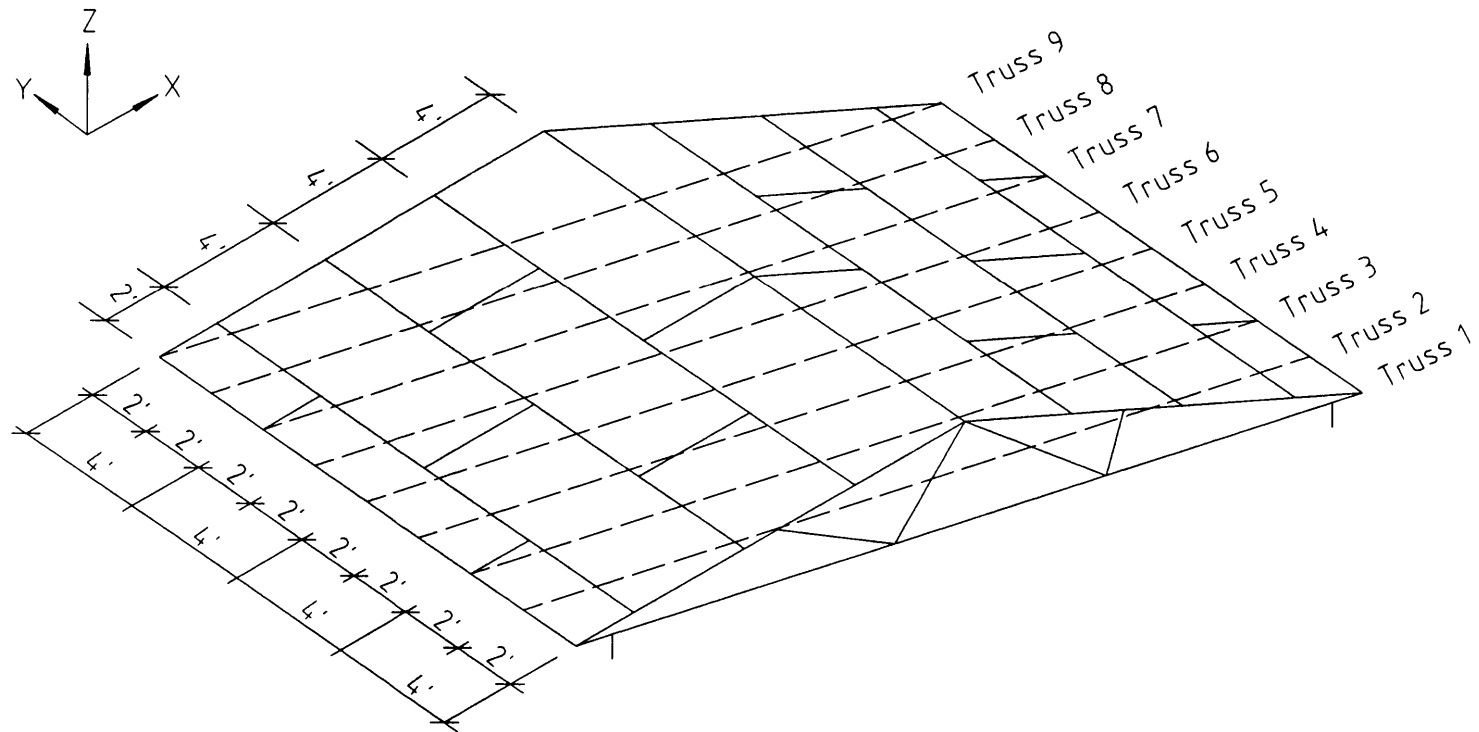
Placement of Plywood Sheathing on 3:12 Slope, 28-Foot-Span Nine-Truss Roof Assembly
